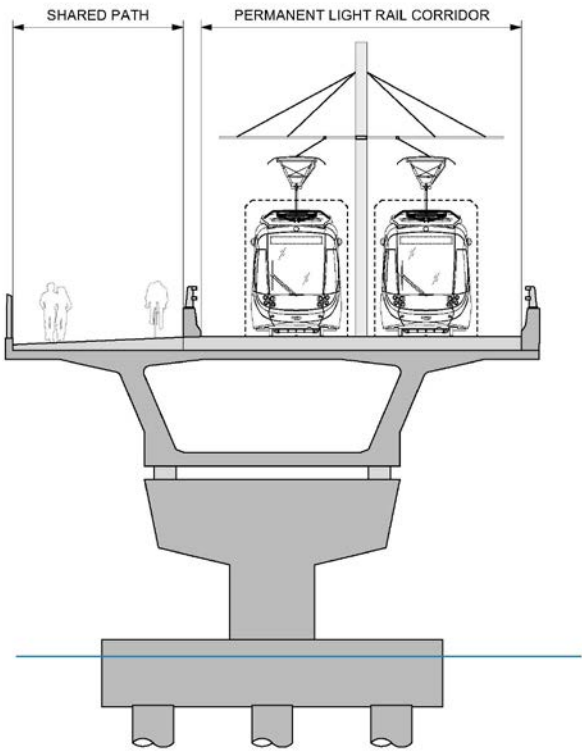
Typical cross section - New bridge between Camellia and Rydalmere at bridge pier (indicative only - subject to design development).
